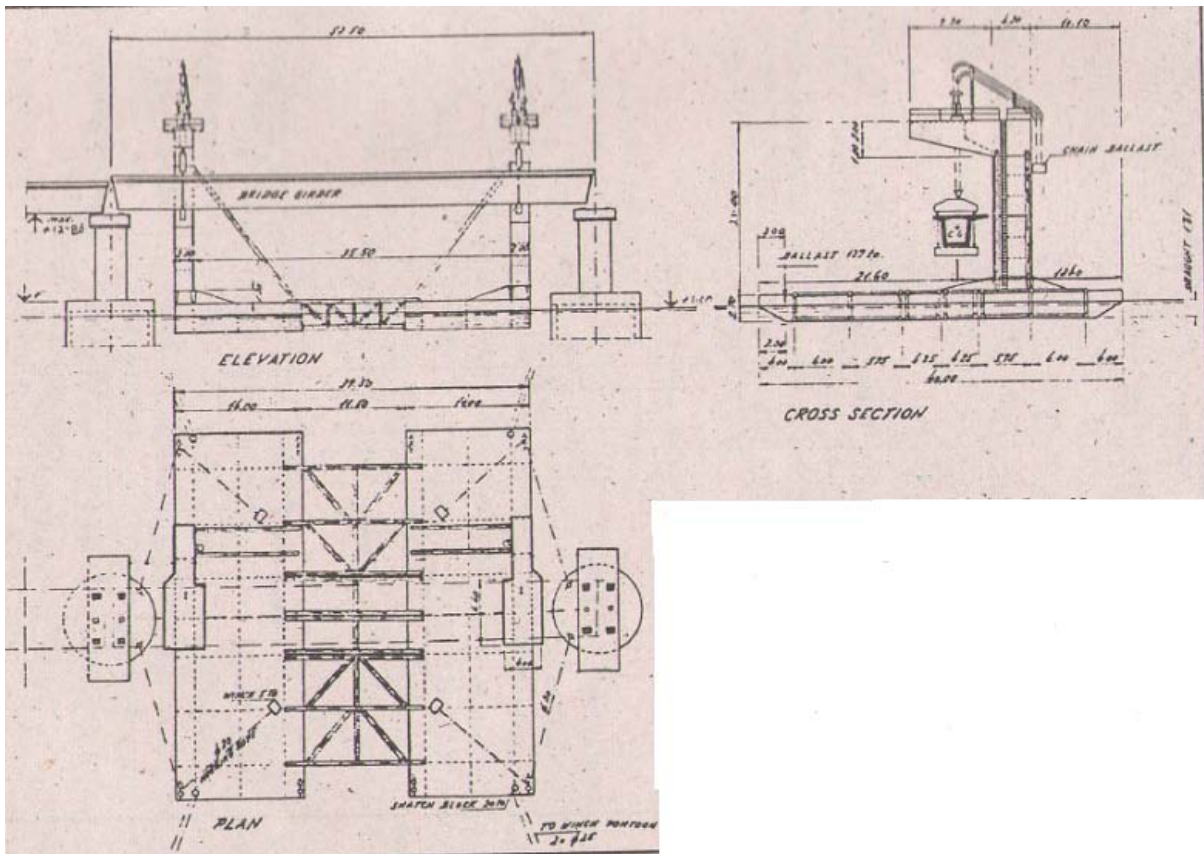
Lifting Arrangement For PSC Girder of Railway Bridge, Zuari - Mandovi
